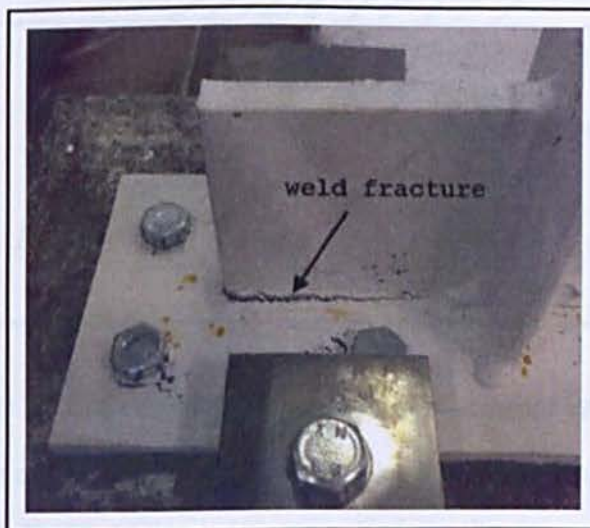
Fracture of weld connection between base plate and left column stiffener at a nominal drift index of 2.5% for W2
